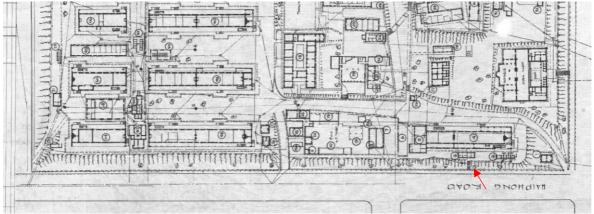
An extract of Whitfield Barracks and Camp, Skeleton Record Plan K/10/61,1961. Note the new external staircase from Haiphong Road to Block S4 (arrowed). (Source: Public Records Office, File No. HKRS913-1-122, 1922)
